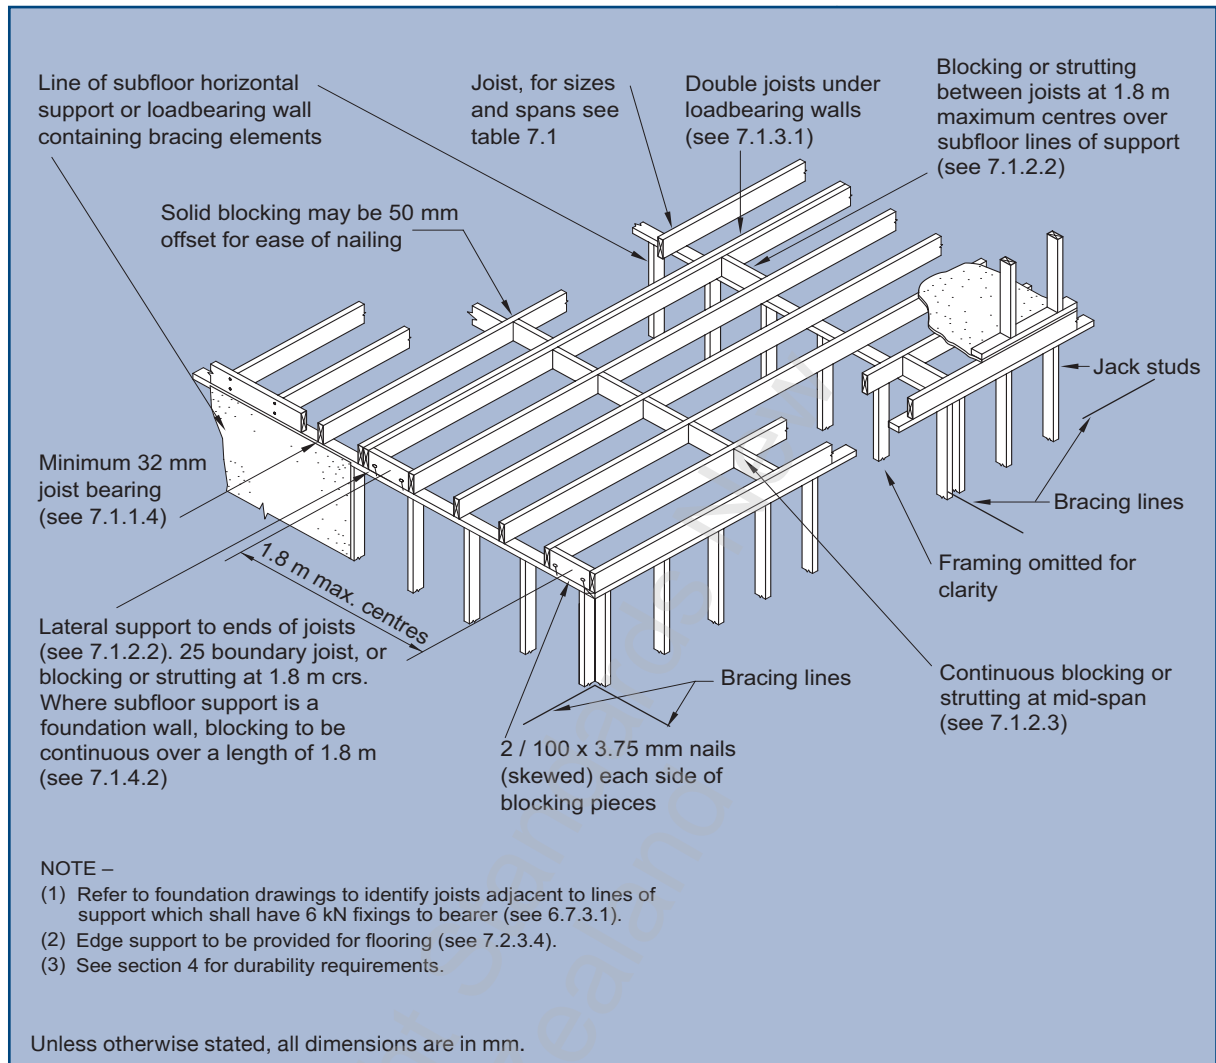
Floor joists layout criteria (see 7.1.2.2)
